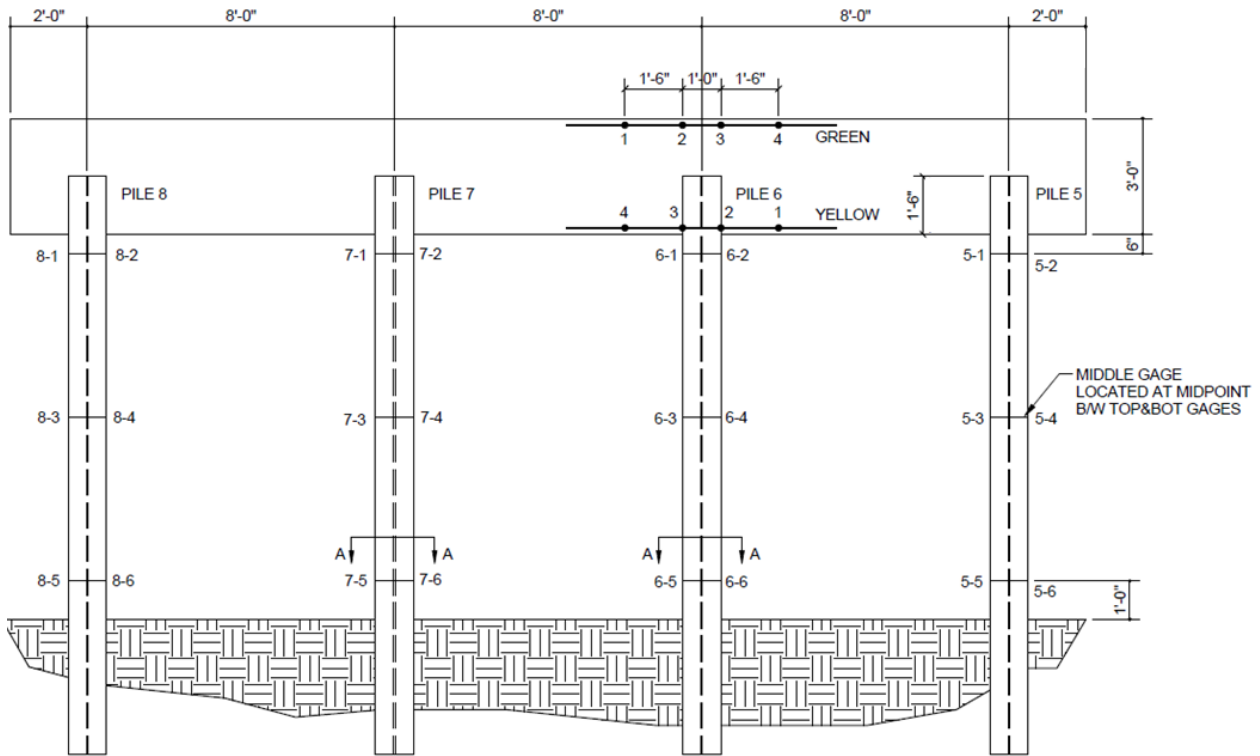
Gage Positions for Vertical Pile Bent Load Test
